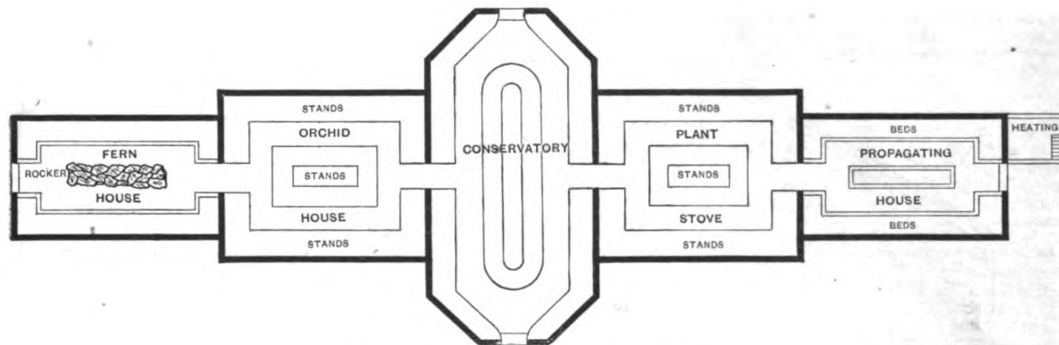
Plan View.—Scale, 1-16 Inch to the Foot.
